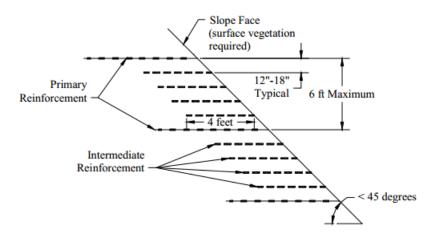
Cross section of reinforced slope with slope angle < 45 [38].
